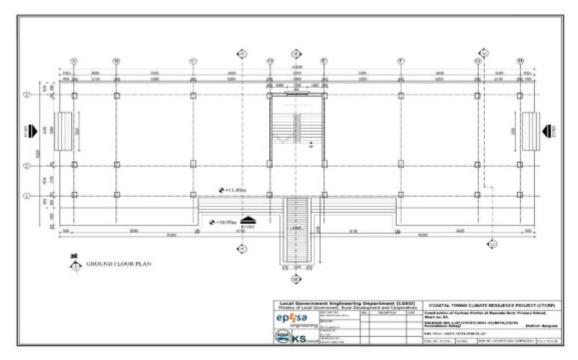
Site Layout Plan for the Cyclone Shelter, Ground Floor
